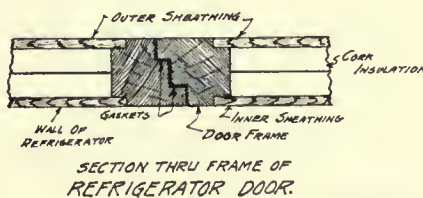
CONSTRUCTION OF REFRIGERATOR DOOR
